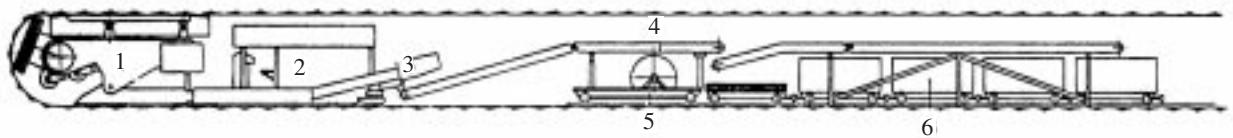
A tunnel boring machine with its support system (from Handewith and Dahmen [10]). 1 = tunneling machine, 2 = trailer with the motors, 3 = machines' muck removal system, 4 = transfer conveyor, 5 = skid frame, 6 = railcars for transporting muck out of the tunnel.
